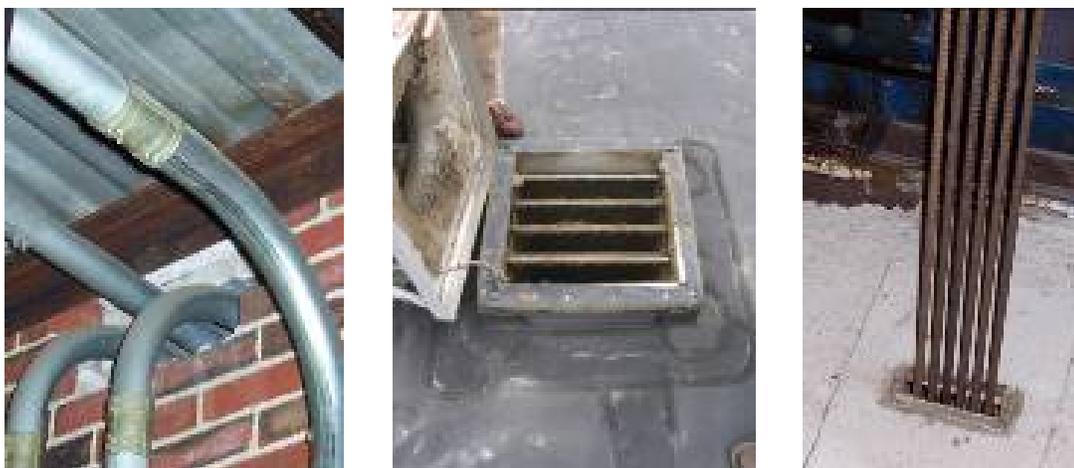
Unsealed penetrations (left); open louvers to vent shafts (middle); elevator cable holes can be made tighter (right).
